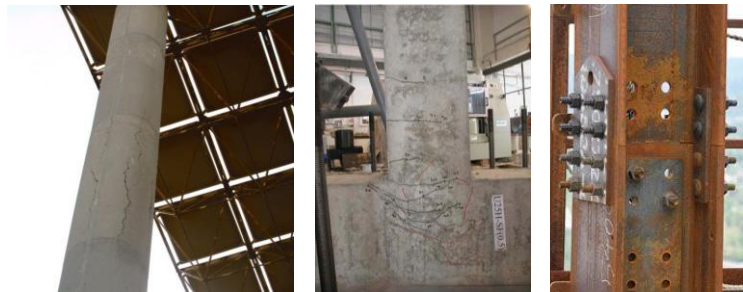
Examples of physical damage of existing structure in the form of (a) cracks in the column, (b) cracks at the location of column-slab, and (c) real joint connections.
